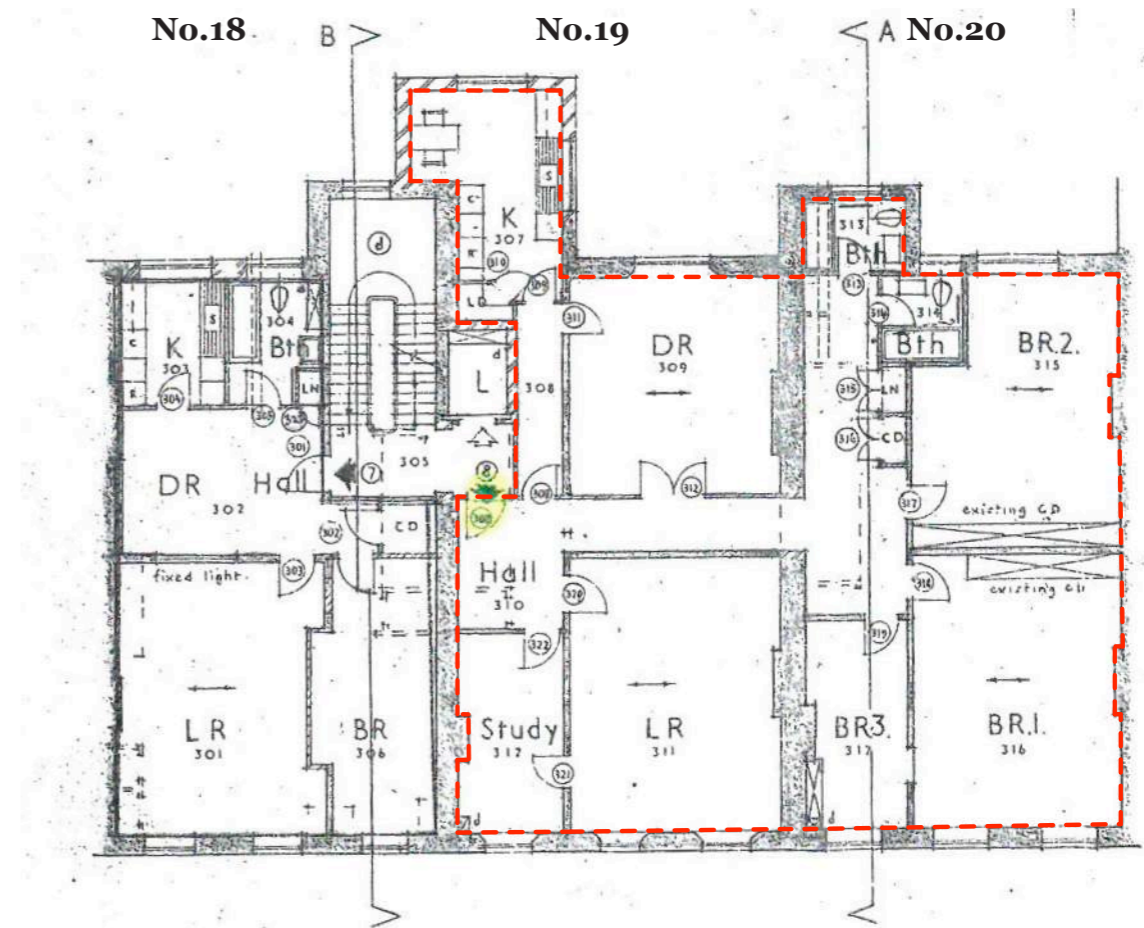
1949 Floor Plan showing proposed layout alterations as part of the lateral conversion and sub-division of the original townhouses into apartments of third floor 18-20 Eaton Square. Flat H shown in dashed red outline.
